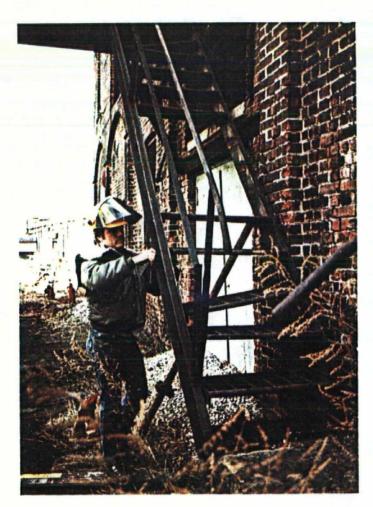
Repairing Stairway to Tank D-13. 4/10/85
